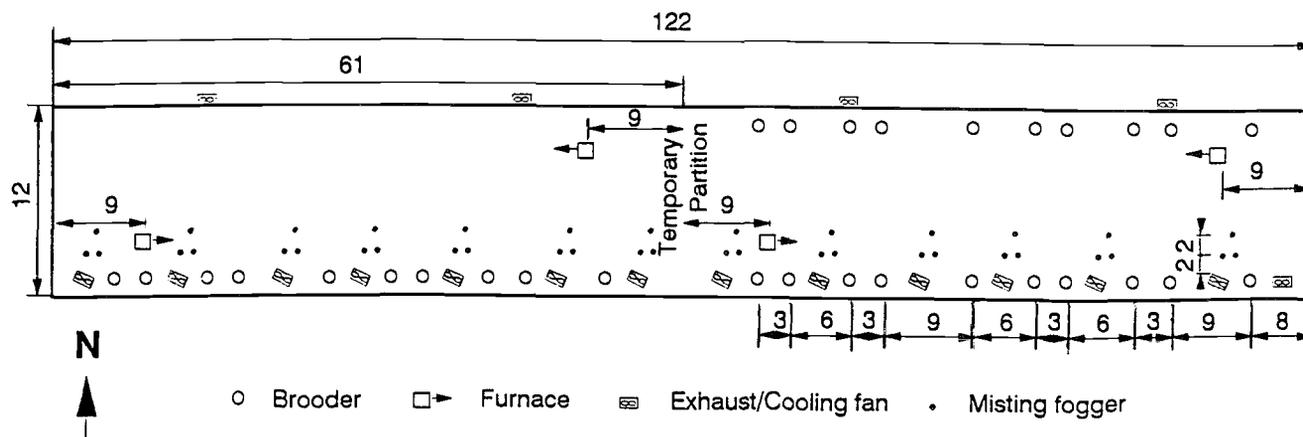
Schematic layout of the heating, cooling, and ventilating equipment of the experimental conventional broiler houses. Side curtains used full length of building (dimensions in meters – ft = m × 3.28).
